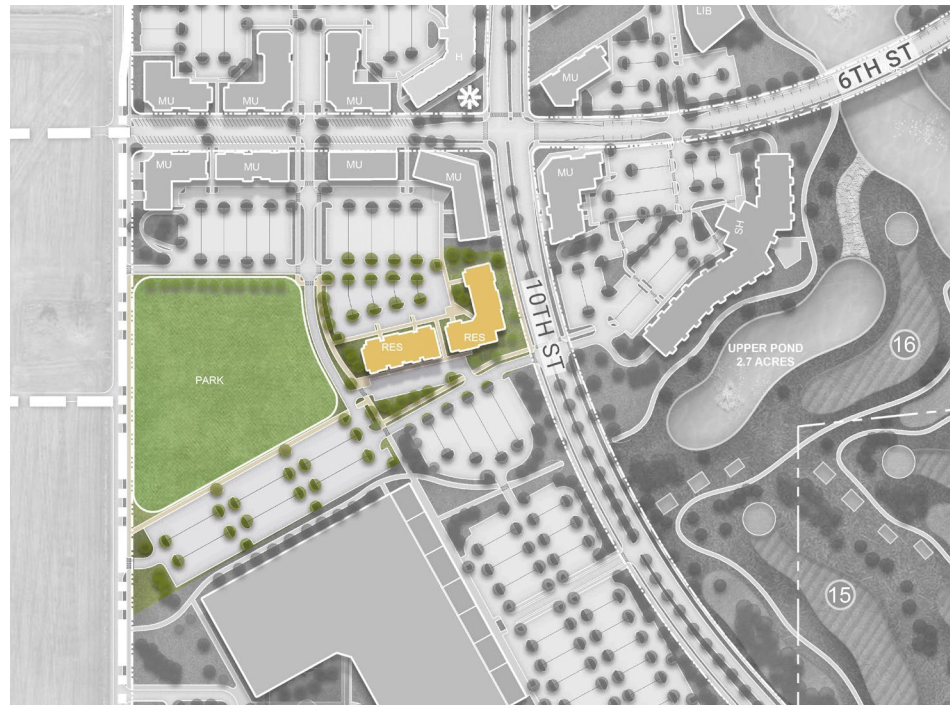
/ OVERALL FINAL CONCEPT - RESIDENTIAL / WATER PARK SPACE
